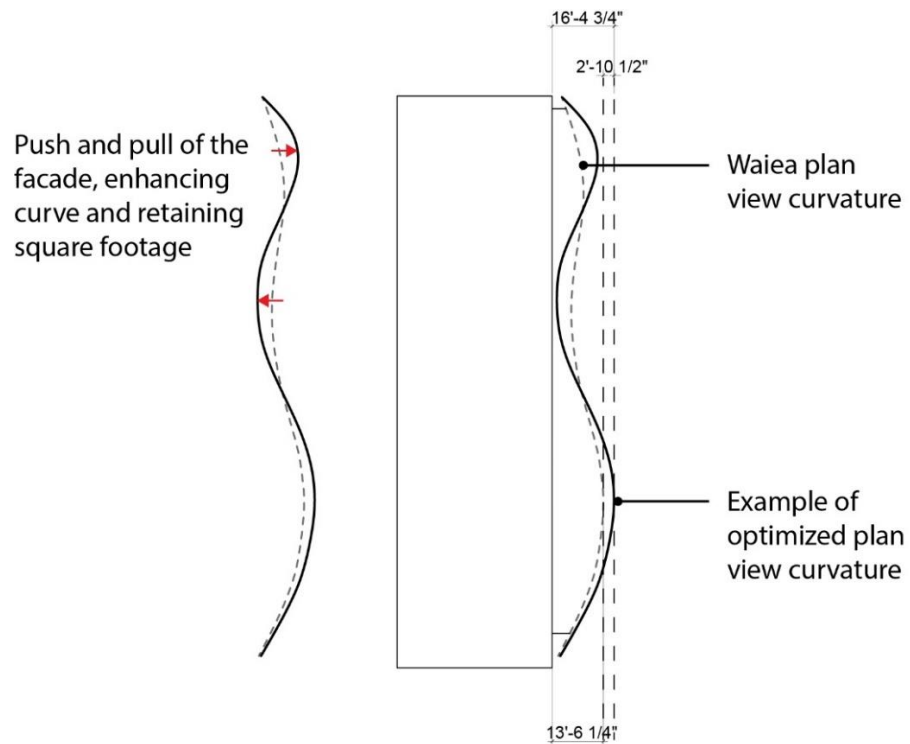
Enhancing cross section curvature (plan view) from cantilevering modules.
